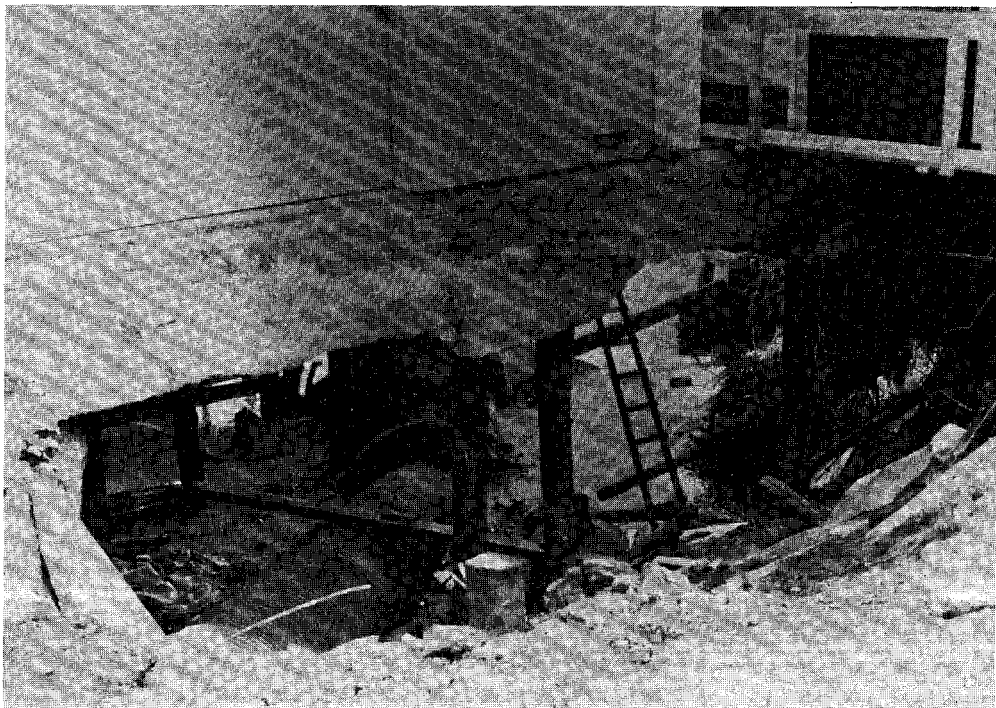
View seaward toward collapse of storm drain and slippage of driveway at 23950 Malibu Road, March 8, 1978. Mile 16.85.
